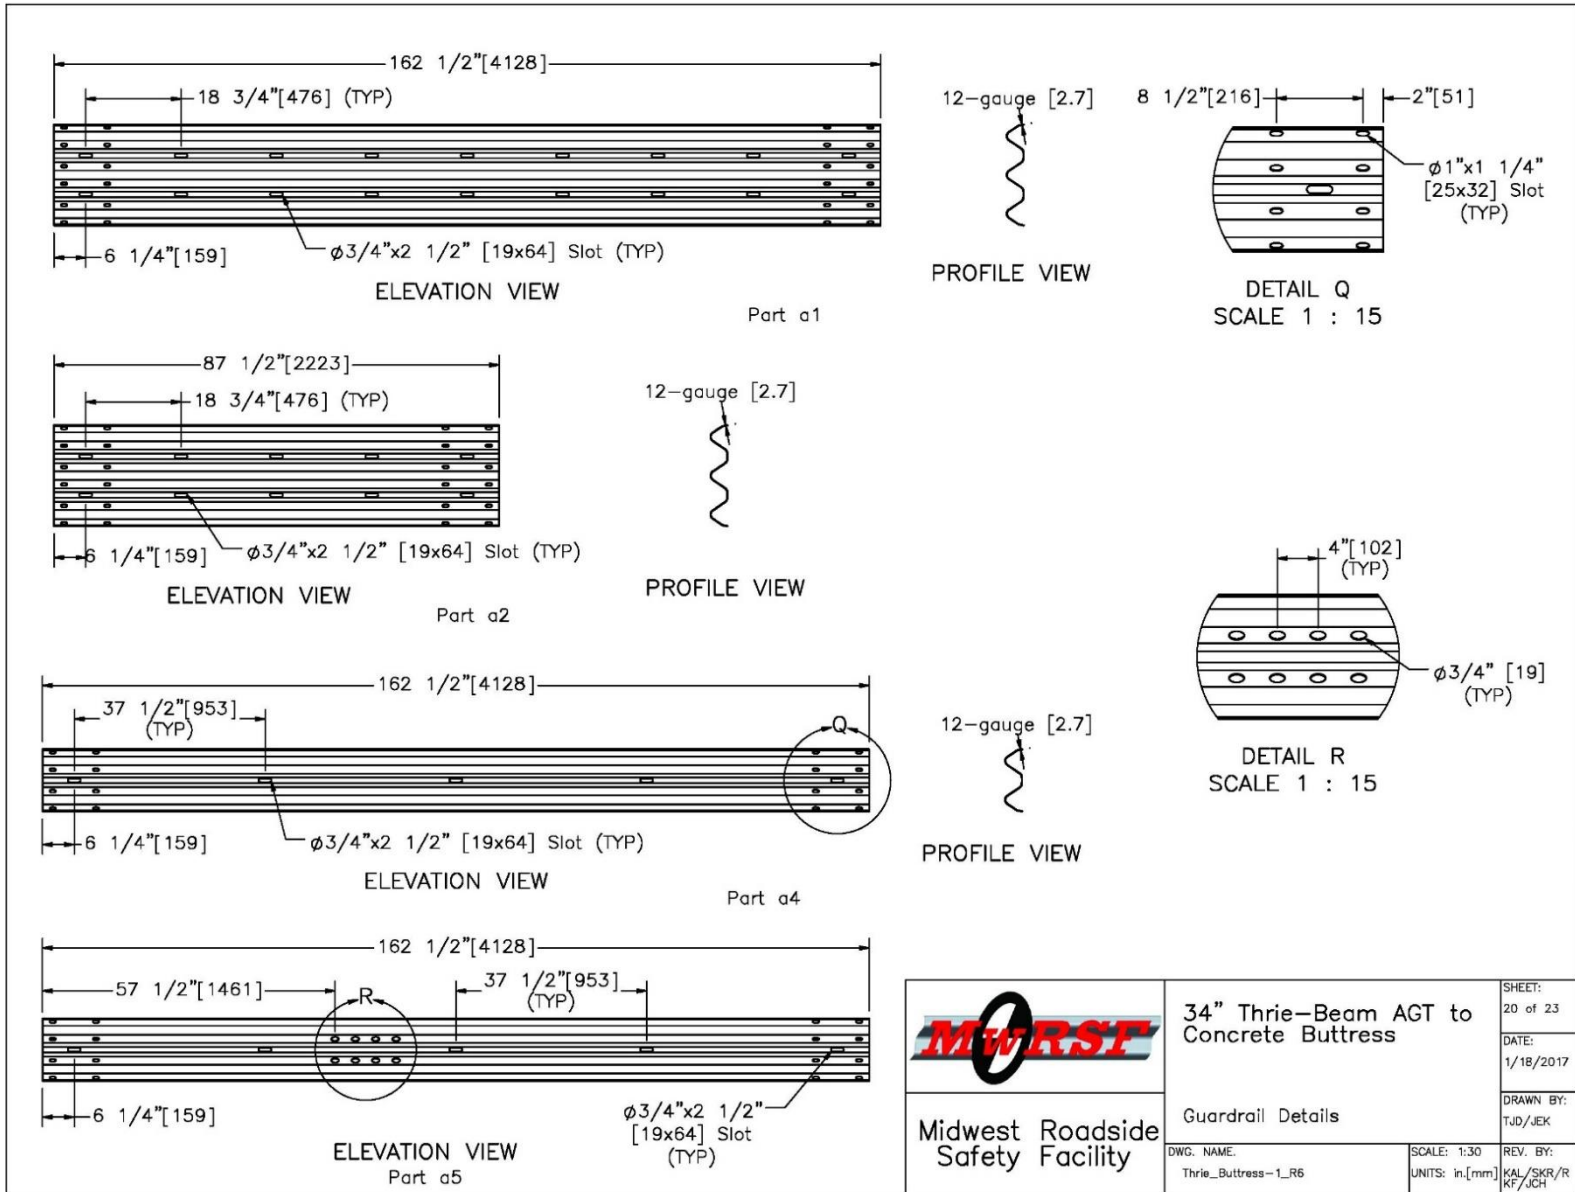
Guardrail Details, Test Nos. 34AGT-1 and 34AGT-2
